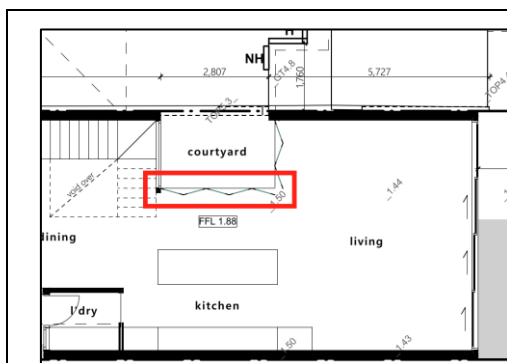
Excerpt from endorsed ground floor plan for 3 Lytton Street, markup showing kitchen concertina door
